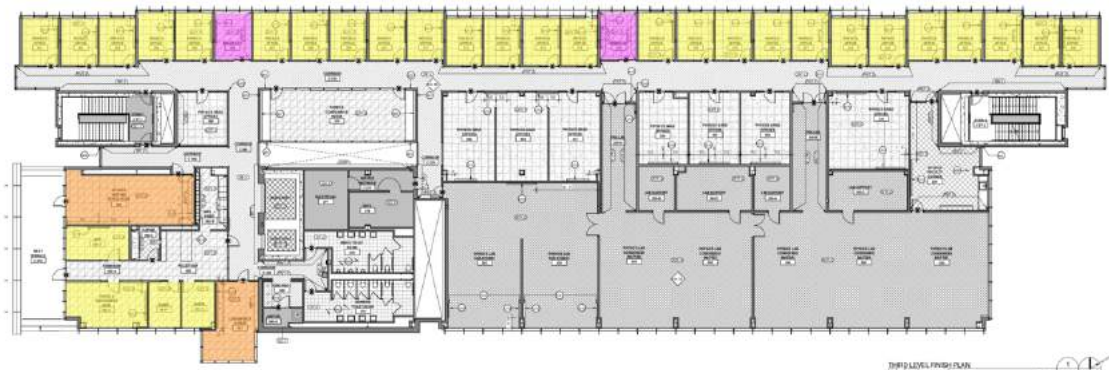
Third floor exterior rooms (Source: Architectural plans)
